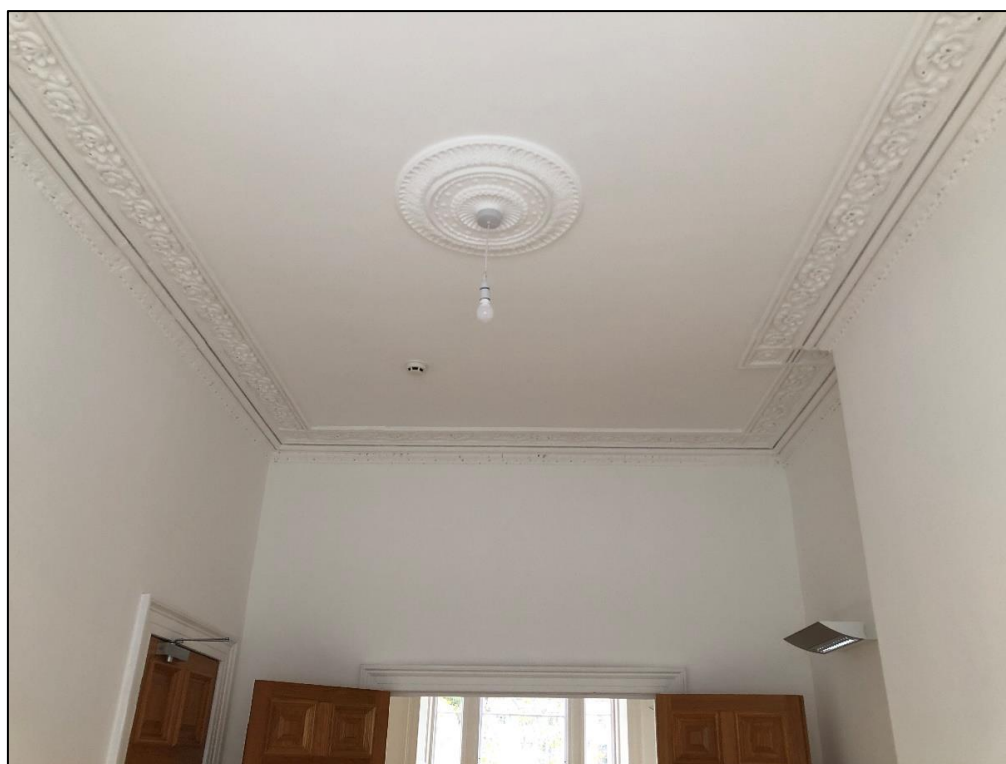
View looking E showing detail of cornice and frieze in first floor back room
